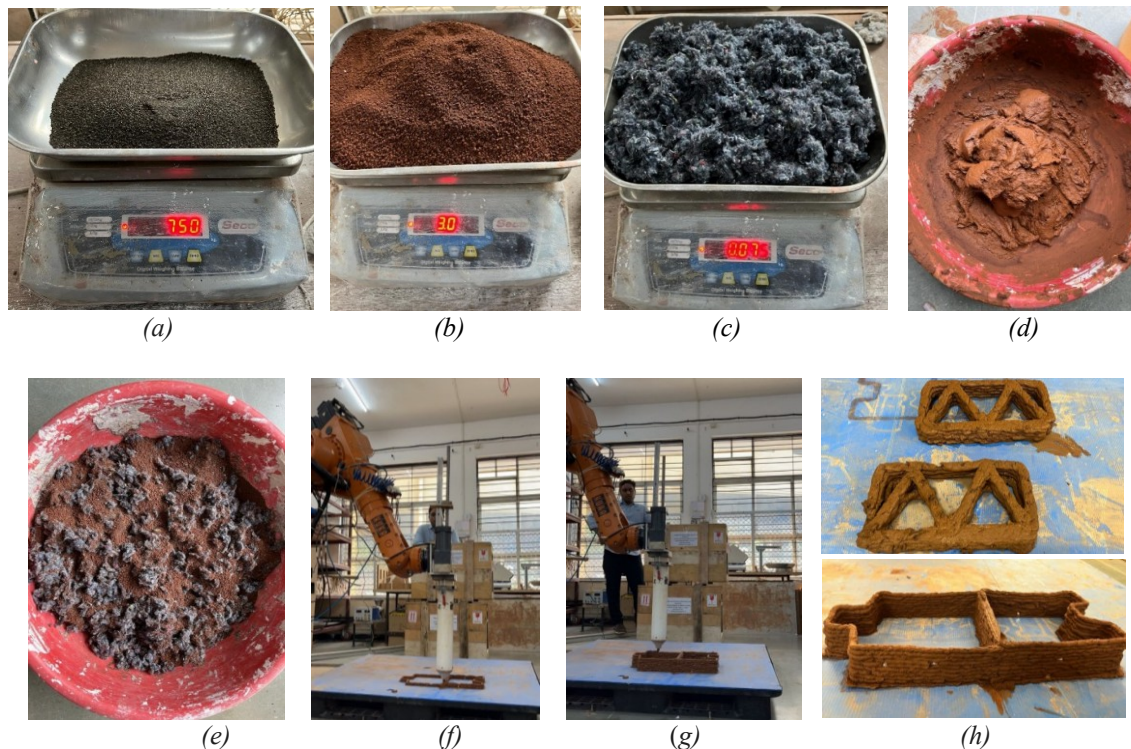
(a) 75 gm of cotton fabric; (b) 3kg red soil; (c) 750 gm of river sand; (d) Dry design mix; (e) Wet design mix; (f) & (g) 3D Printing through KUKA KR 30; (h) 3D printed fabric-mud block
